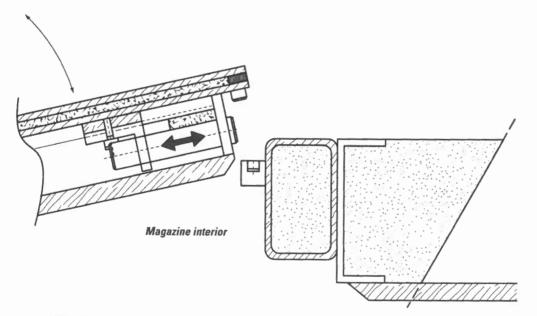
Typical Types 1 and 4 magazine door and frame in open position.
